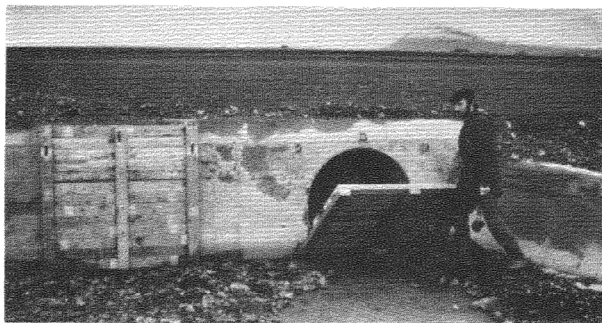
Double culverts under the new runway. The wooden doors have been replaced with plastic sheets.
